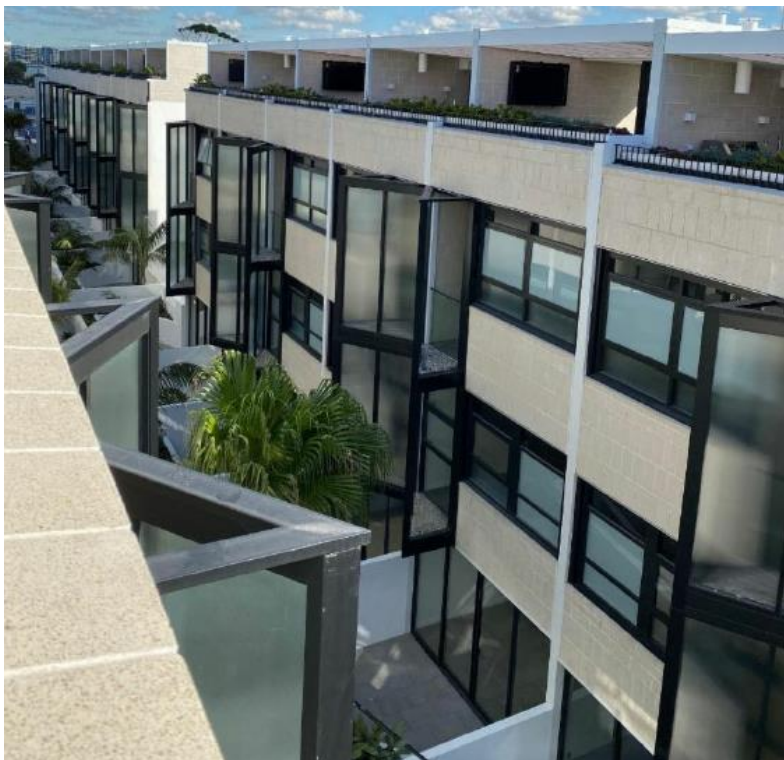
obscure-glazed windows and balconies at 29-41 William Street (source: applicant drawings)
